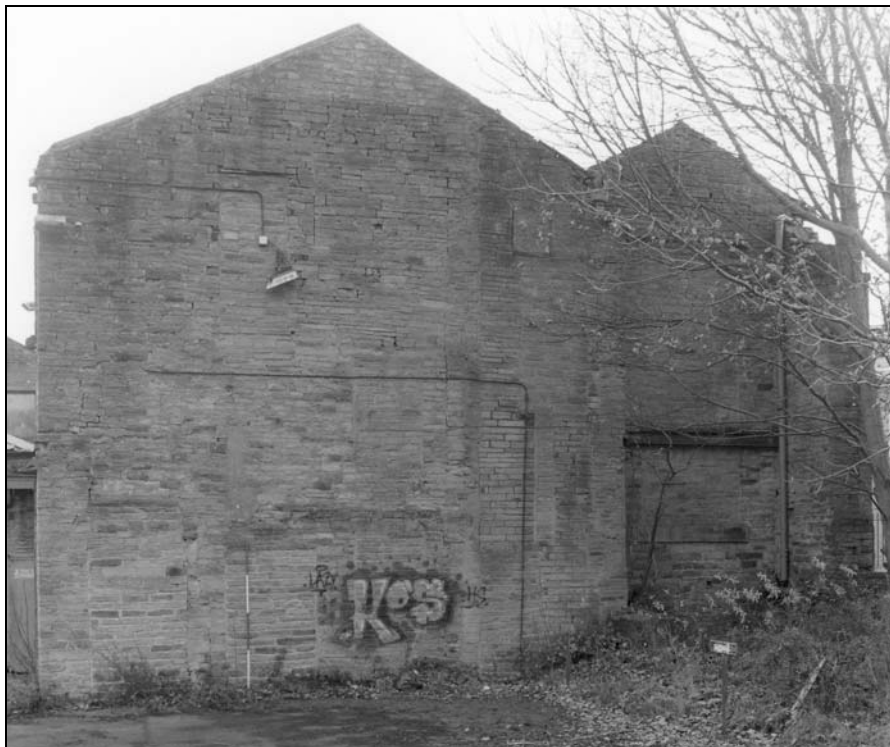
West end of surviving two storey block (following truncation) (film 1, frame 15)
